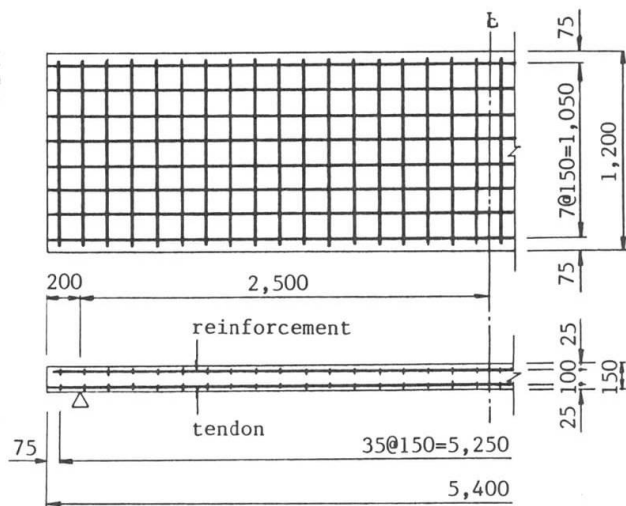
Tendon and reinforcement of prestressed concrete slab
